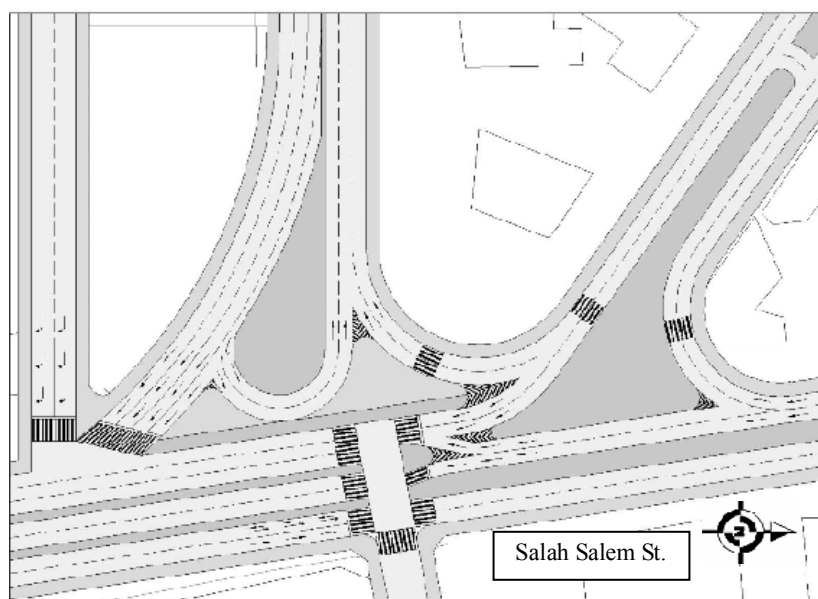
Improvement Plan for Salah Salem St.-Malek El Saleh Br. Intersection
